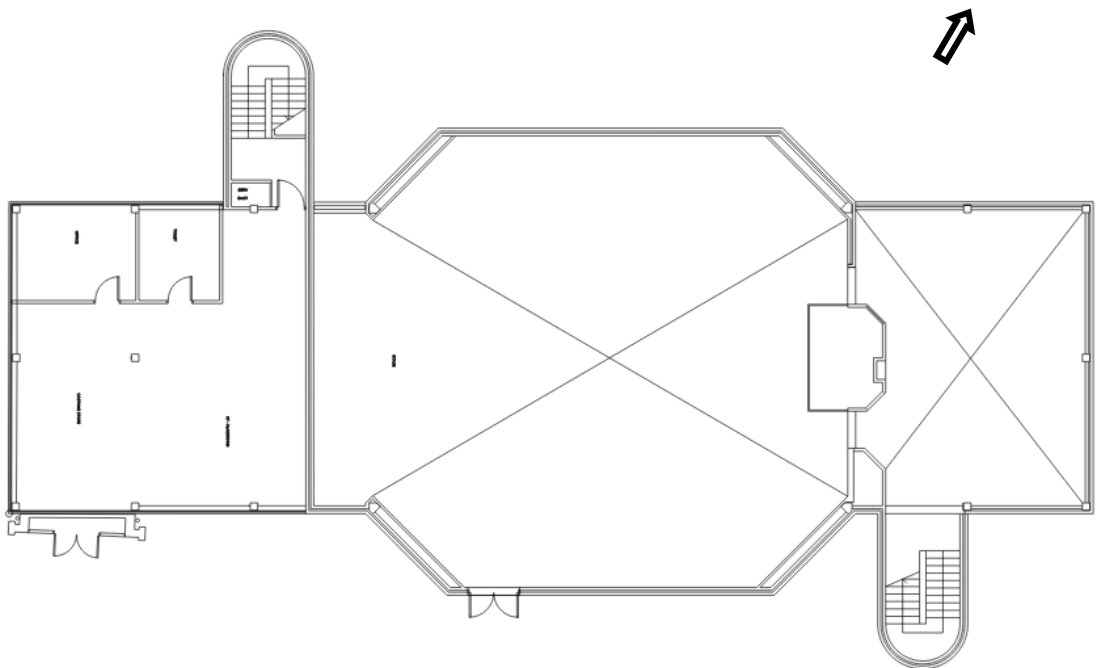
Plan of Sixth Form Centre prior to extension in 2010
